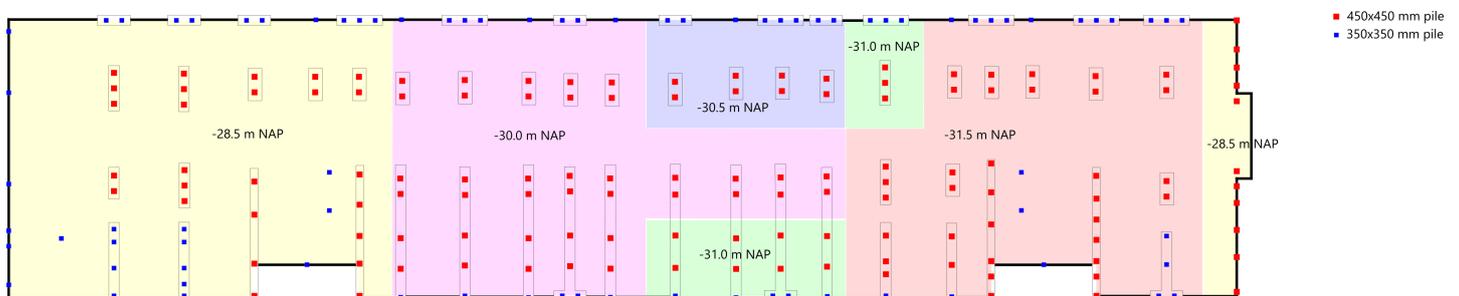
Pile Plan - KasseNova aan de Vaart - Design Variant 3
